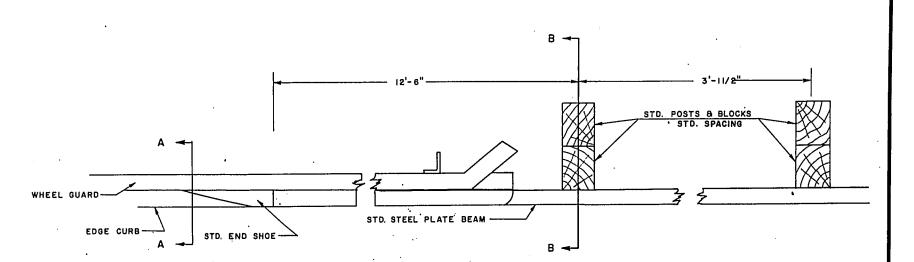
DETAIL AT STRUCTURES WHERE BRIDGE DECKS ARE TO BE REPLACED IN FUTURE
